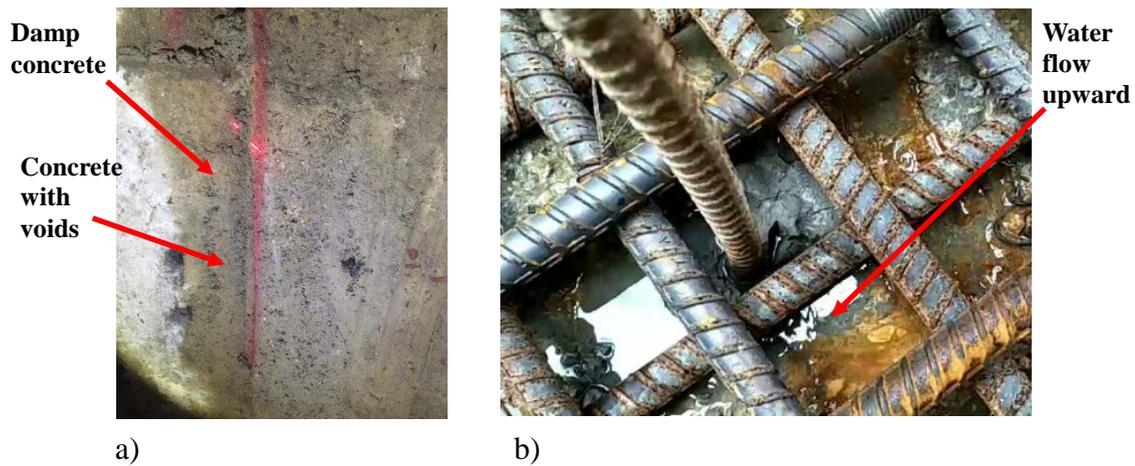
a) Visible water due to channeling in diaphragm wall and b) Water upward flow around the rebar of bored pile.
